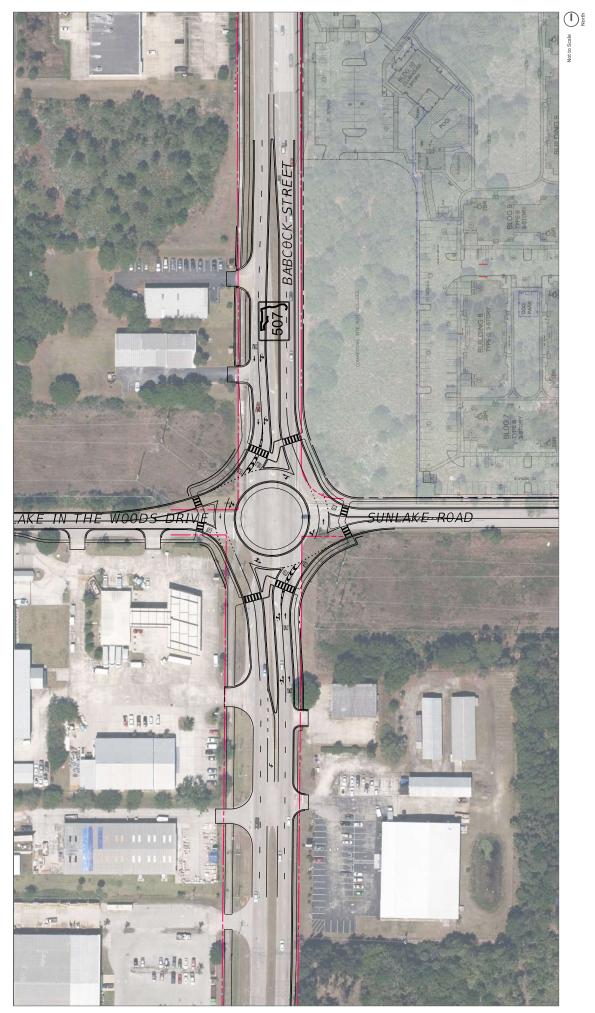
| Babcock Street at Sun Lake Road - Roundabout Concept
